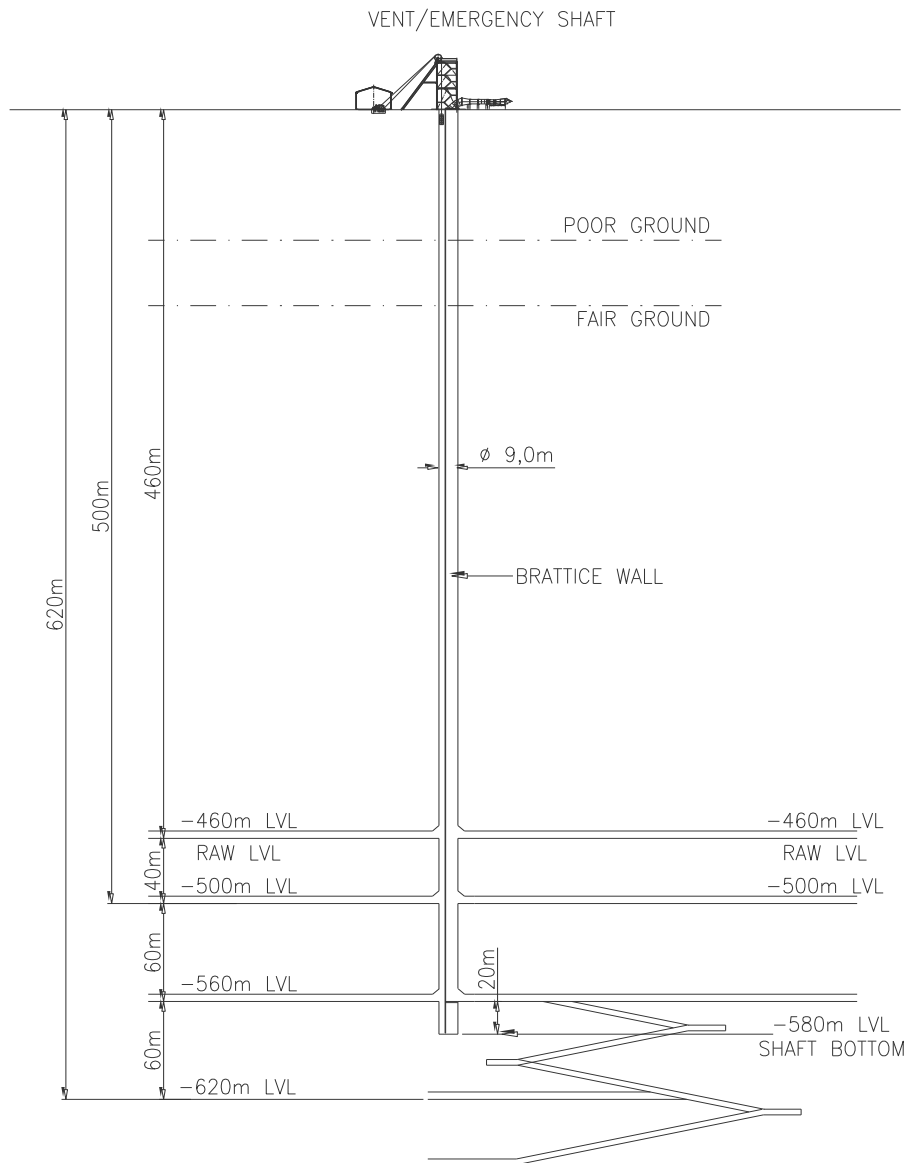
LONGITUDINAL SECTION OF THE VENTILATION SHAFT
